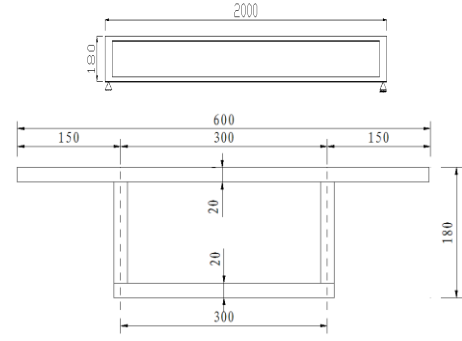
Elevation and sectional view of the composite box girder with corrugated steel web (Unit: cm)
